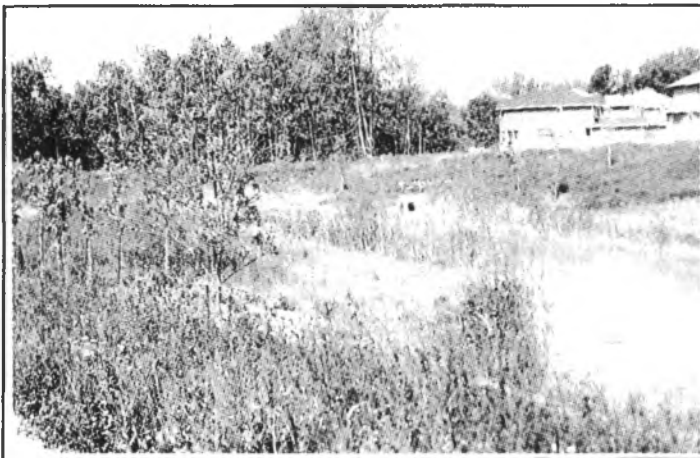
Stormwater Pond in Ajax, Ontario - after construction
